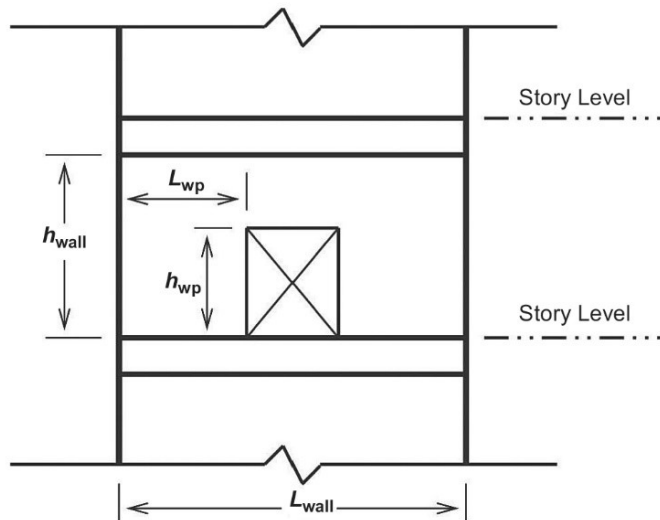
Shear wall and wall pier height-to-length ratio determination
